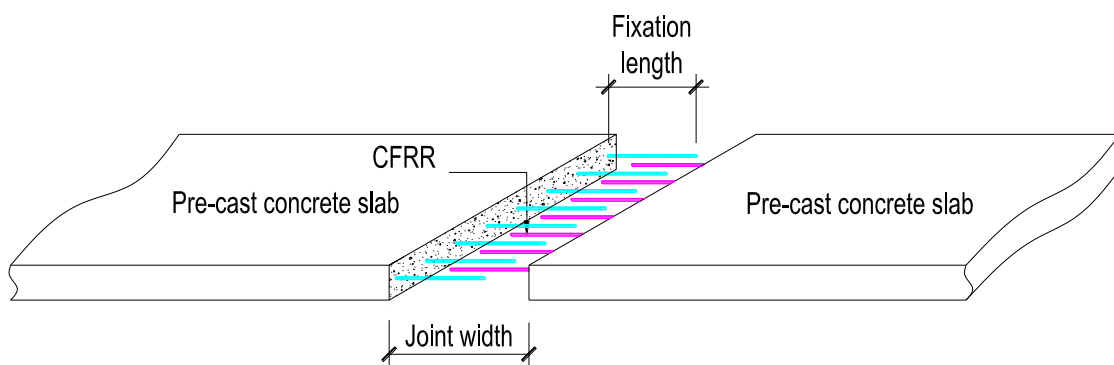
The cast- in-situ joint of precast concrete slabs reinforced by CFRP
